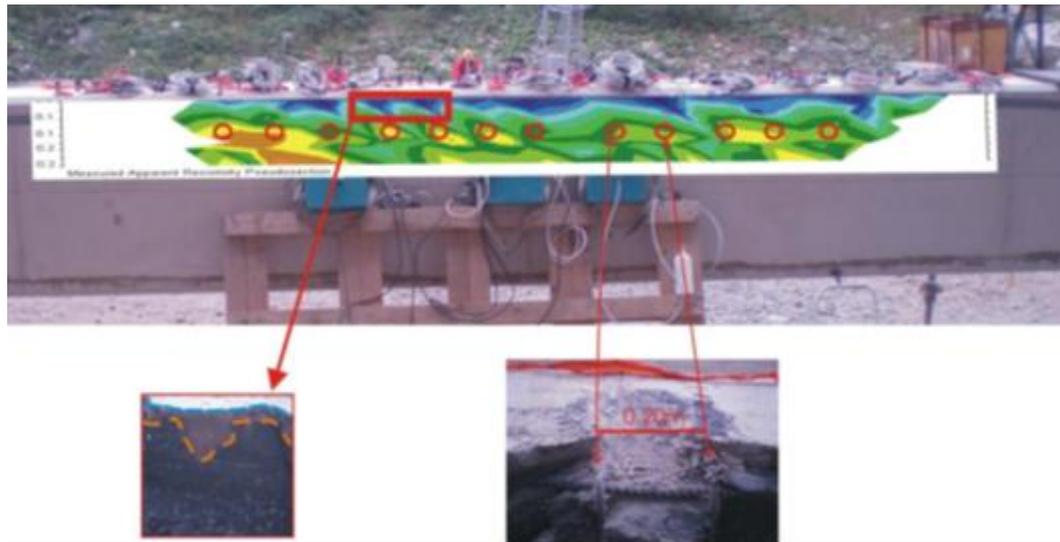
ERT carried out on a reinforced concrete beam: electrical resistivity pseudo-section referenced to the beam and its internal structures
